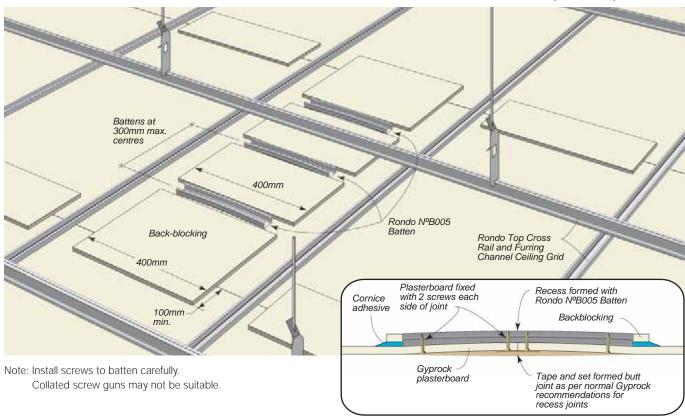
shows suitable details for suspended ceilings where back-blocking is required.
